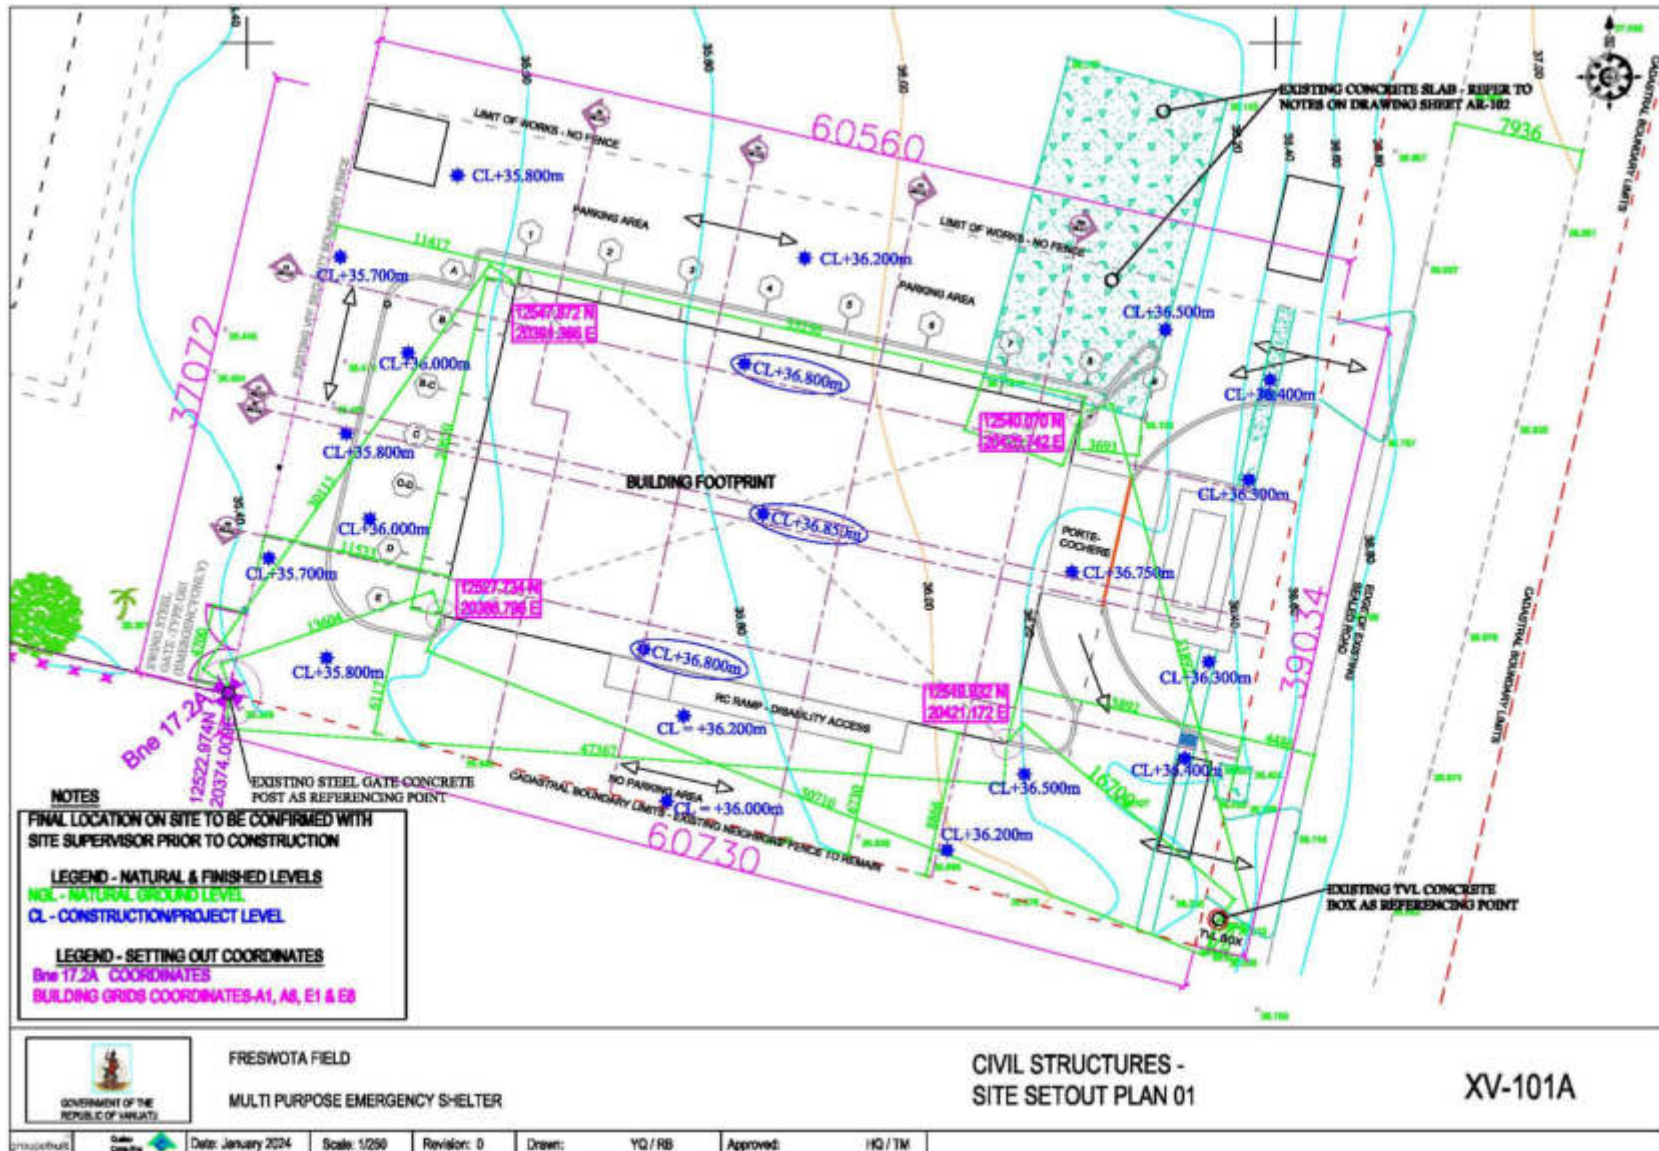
Korman – Civil structure site setout plan showing the main elevation of the construction
